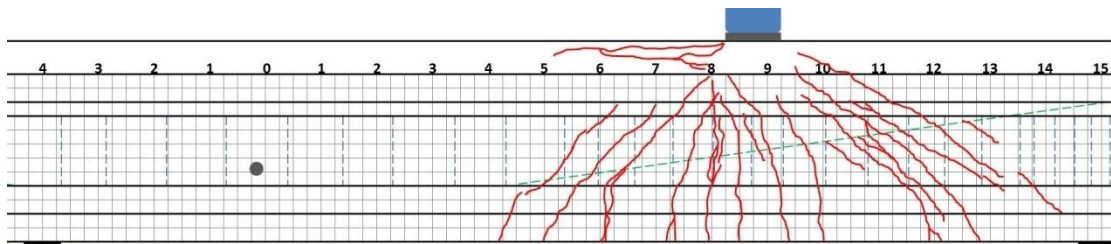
Shear test A2 cracking; strand rupture occurred at the 8 ft mark (3 in. grid shown)
